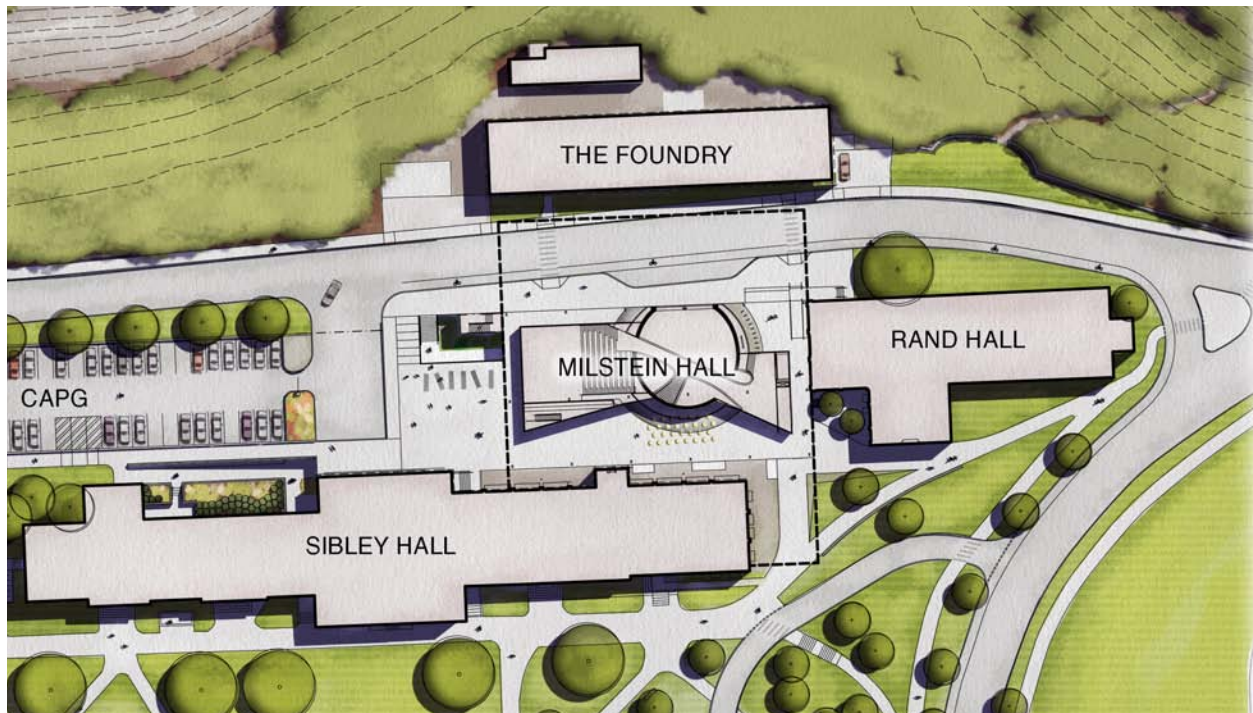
Illustrated site plan, Milstein Hall.
